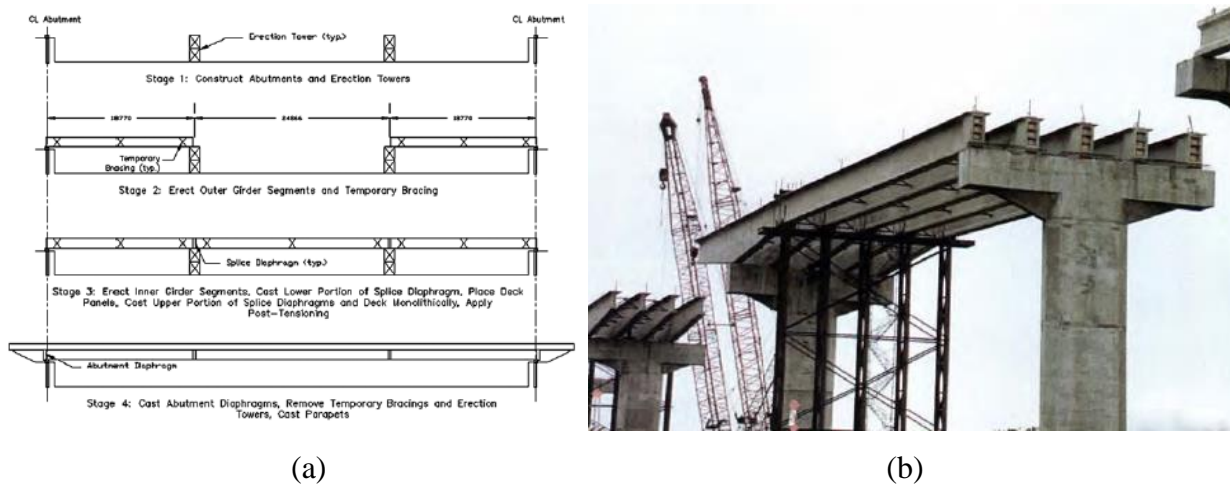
Multistage splicing of prestressed concrete bridges: (a) 4500 South Street in Utah (Pantelides et al. 2007); (b) Highland View Bridge in Florida (Janssen and Spaans 1994)
